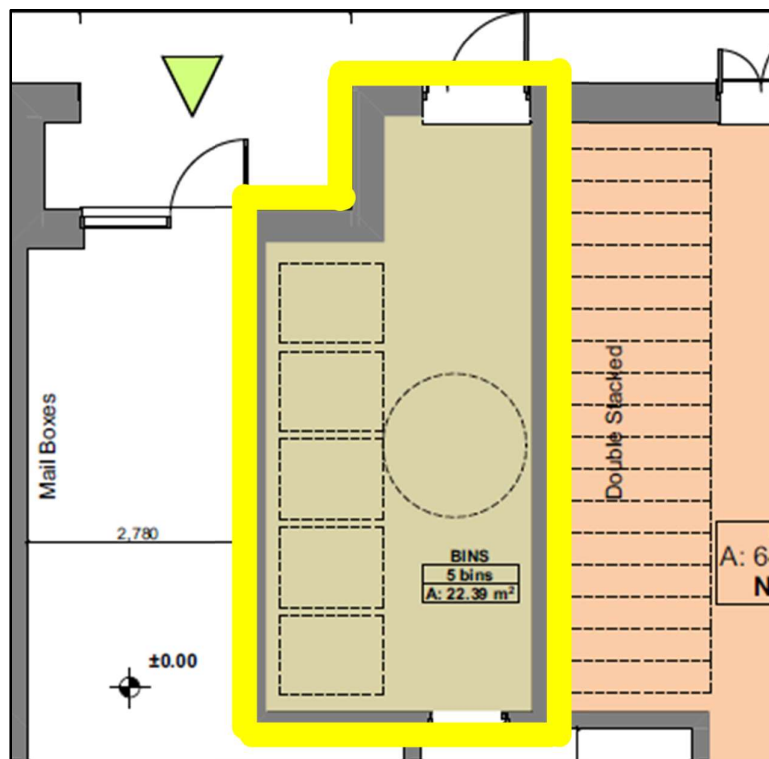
Internal Layout of Shared Waste Storage Area for Apartment Block A1 (Yellow) (Davey Smith Architects, 2025)
